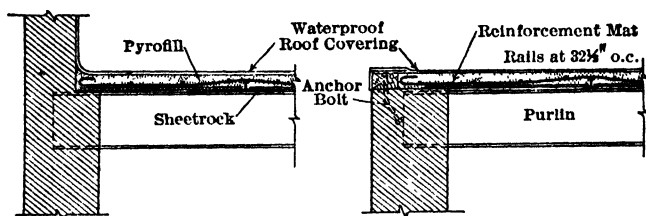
Sheetrock-Pyrofill Roof-Slab
